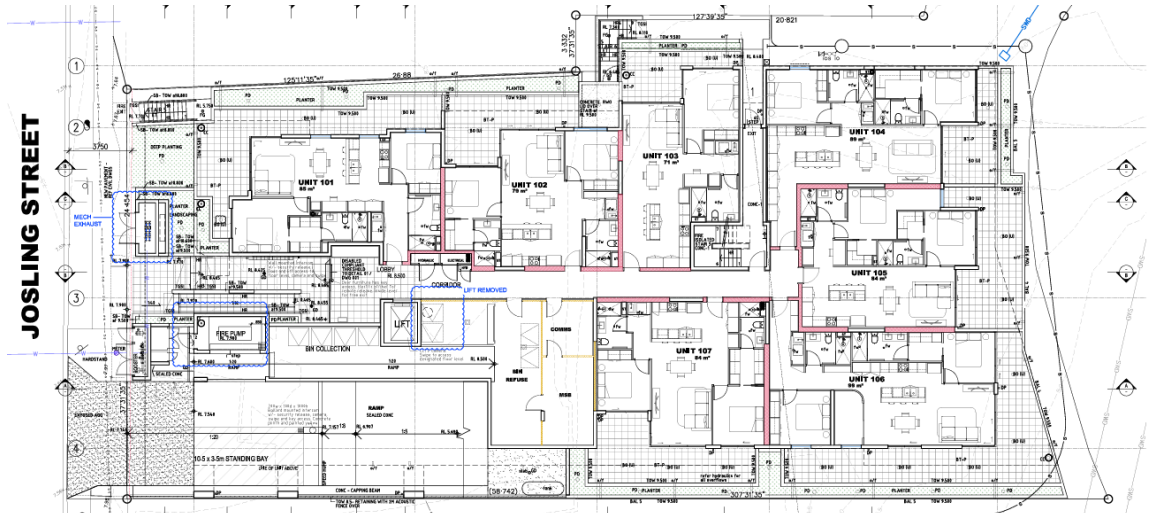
Extract from amended Ground Floor plan - parking supply intercom for secure gate
